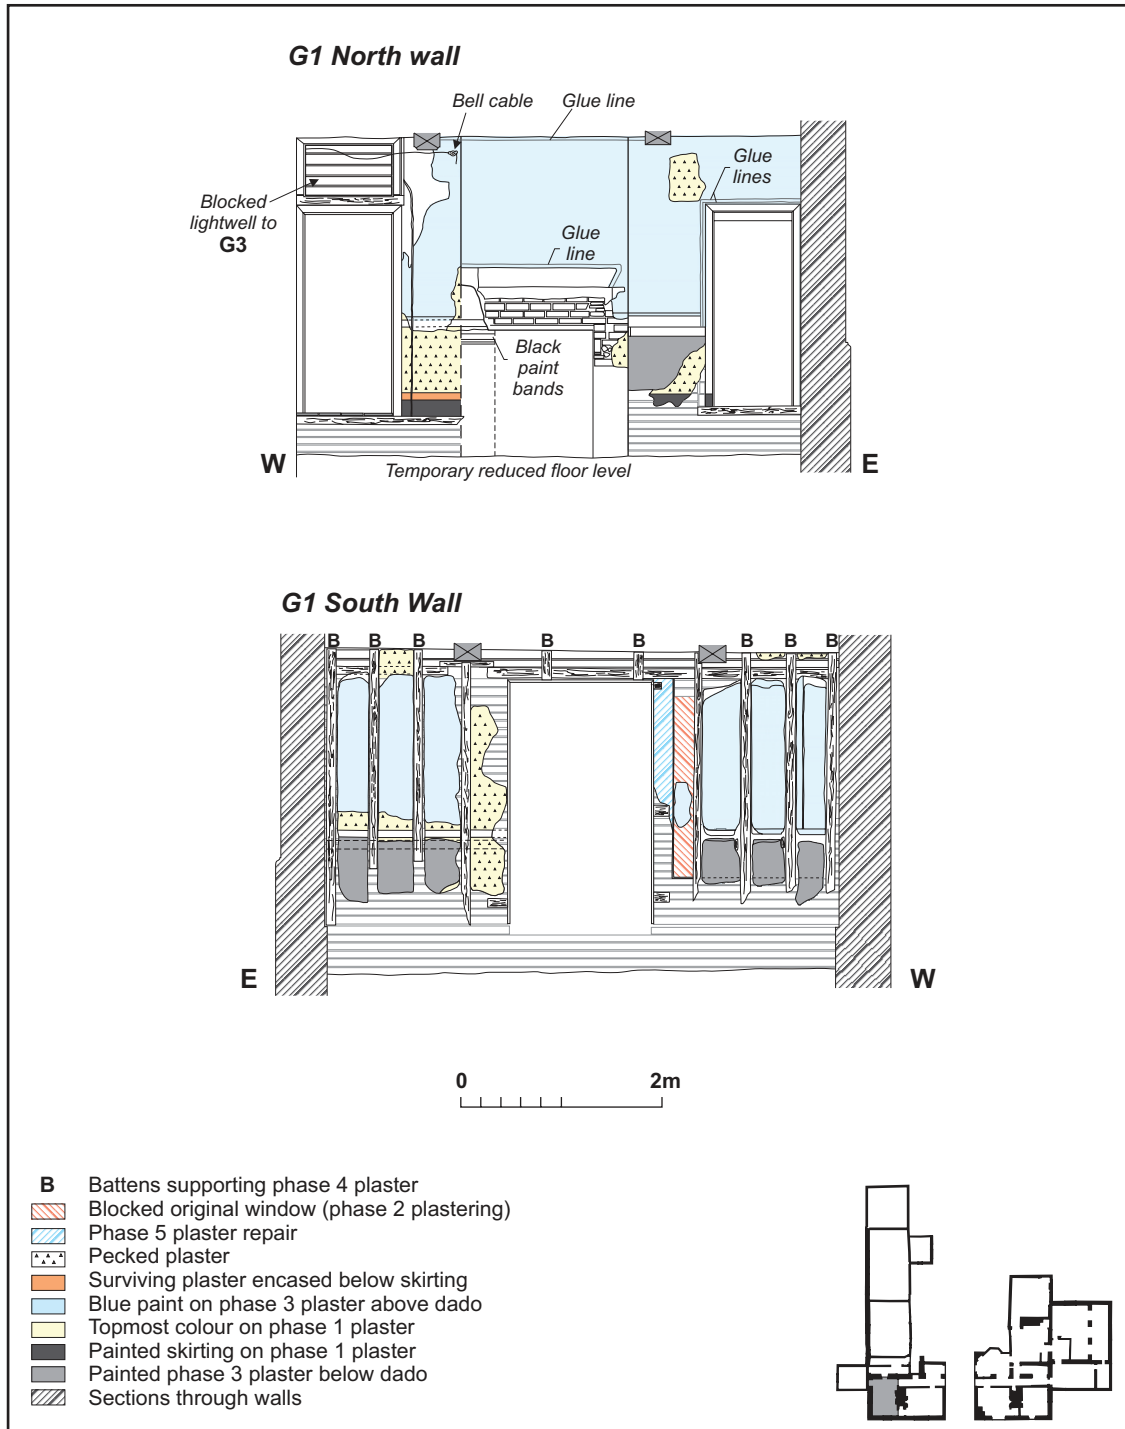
Elevations of the north and south wall of parlour G1 showing evidence of decorative schemes
